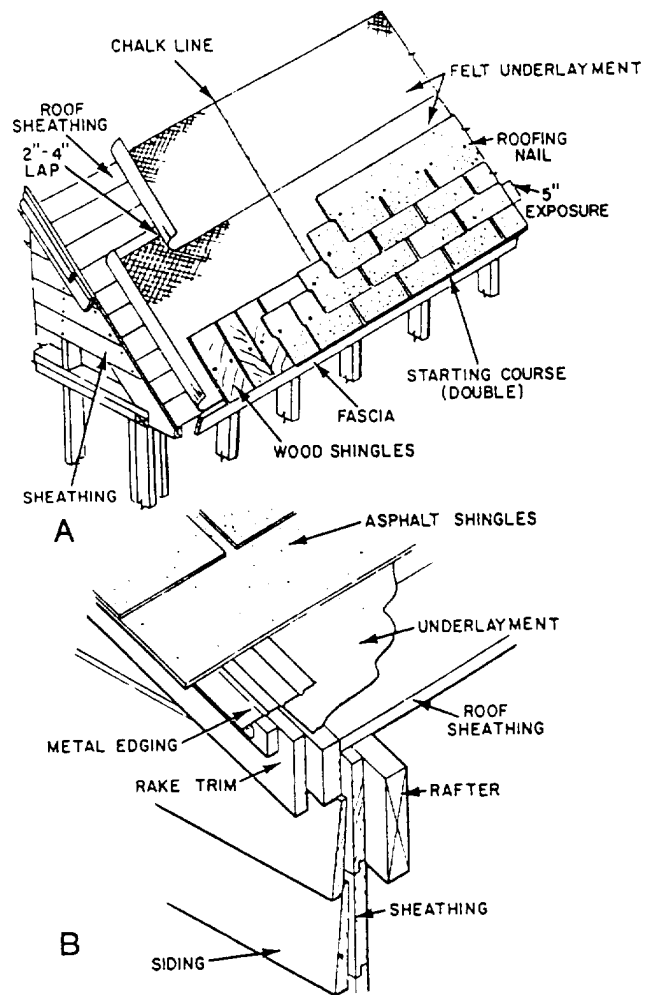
Application of asphalt shingles: A. Common method with strip shingles; B. Metal edging at gable end.
